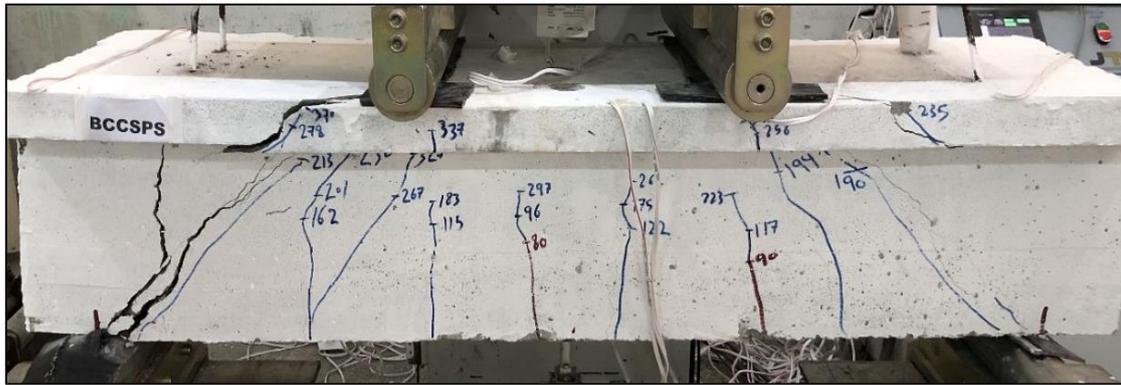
Failure mode of box girder (BCCSPS)
